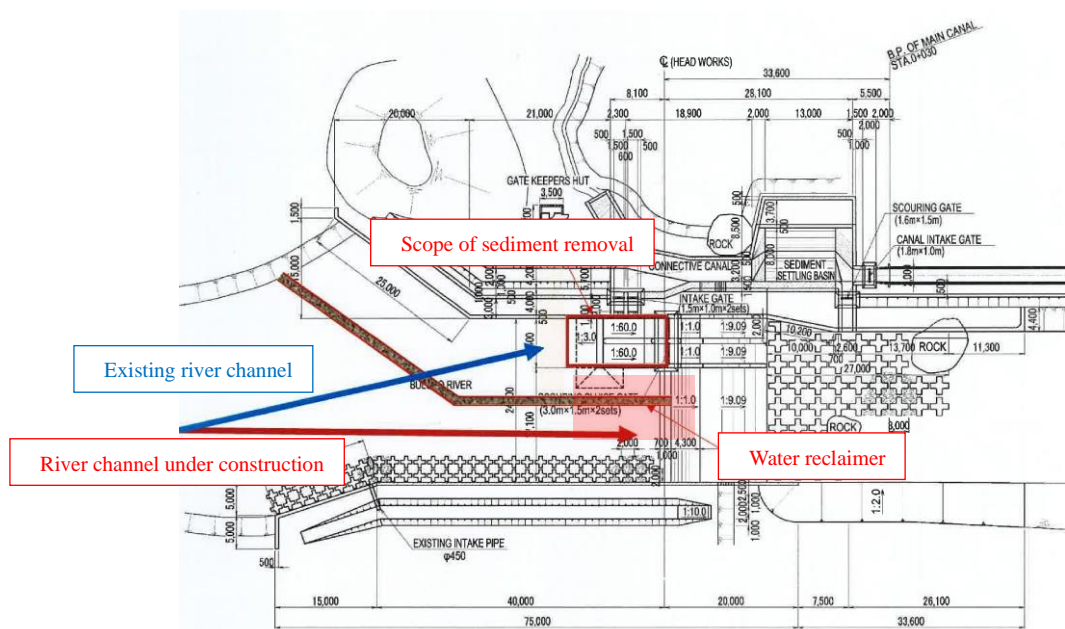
Temporary construction plan of the headworks (draft)
